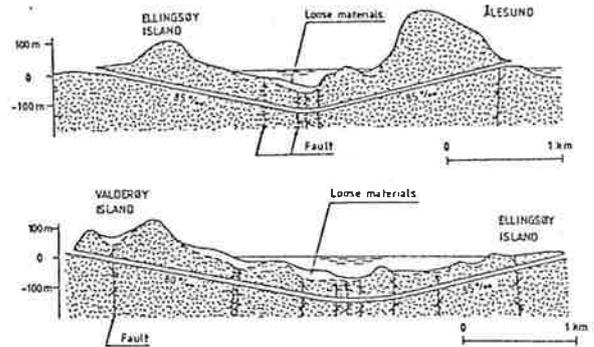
The two Ålesund road tunnels of 75 m² cross section opened in 1987, were constructed in 1.5 years. The total length of the tunnels excavated in Precambrian gneiss is 7.7 km with the lowest point 140 m below sea level.
